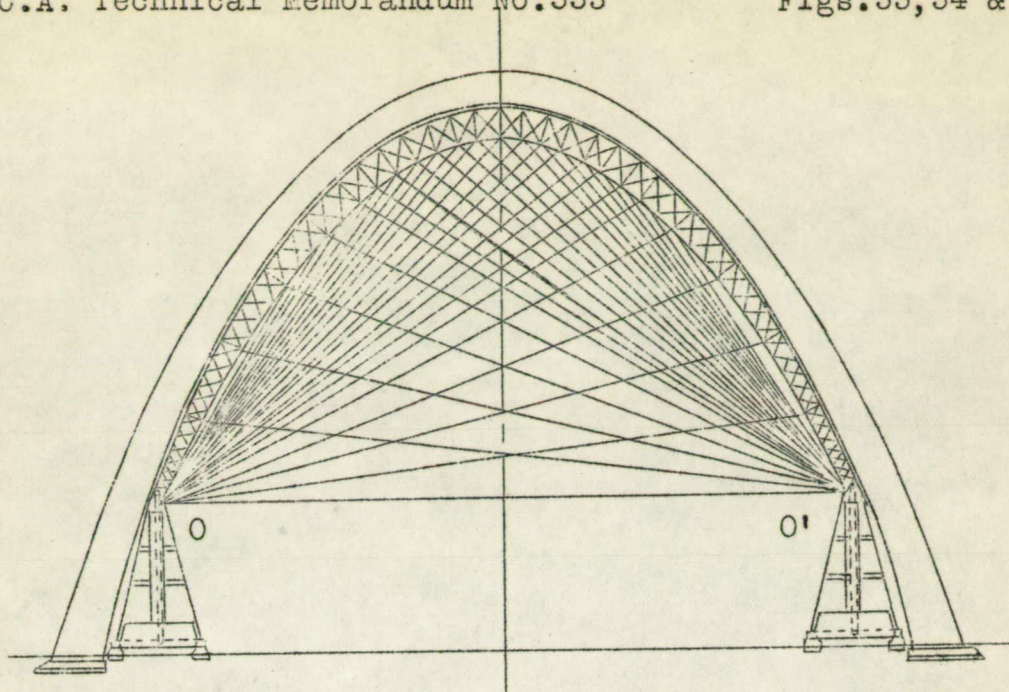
Elevation of centering mounted on two reinforced concrete supports and wind-braced by stay-cables.
